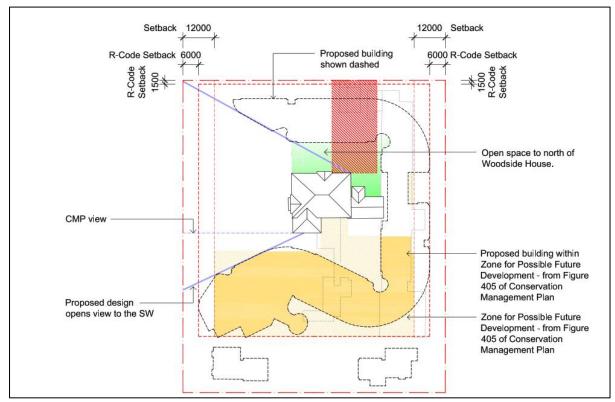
Diagram illustrating the site constraints and how they have informed the arrangement of built form (source: Kerry Hill Architects). Refer Appendix 02, Architectural Design Report.
